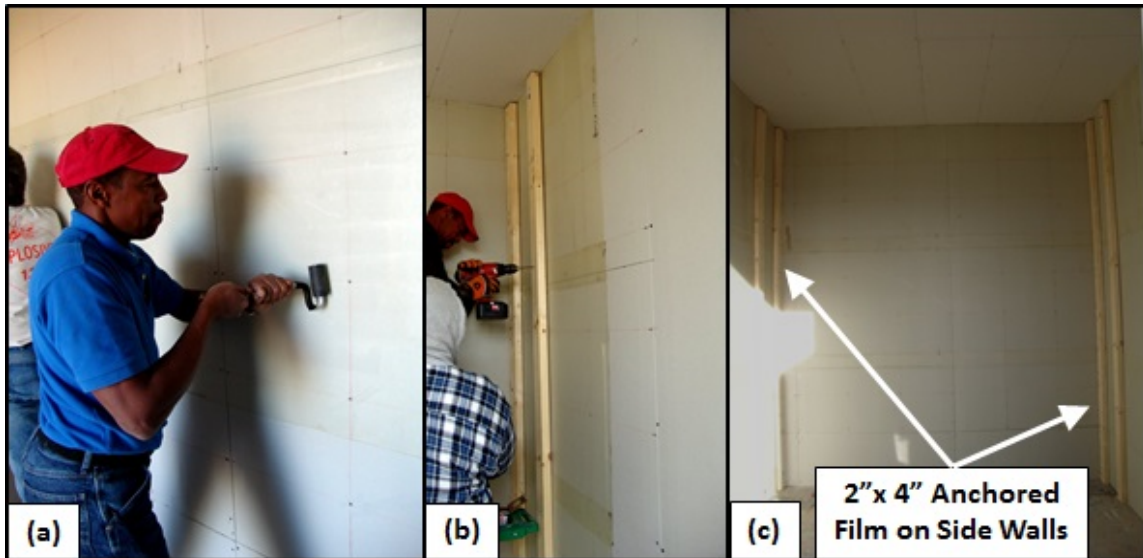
Retrofitting conventional wood construction. (a) Unreinforced elastomeric film applied horizontally across the front wall. (b) Dimensional lumber (2-in. by 4-in.) used to anchor retrofit to side walls. (c) Anchors were applied to both side walls.
